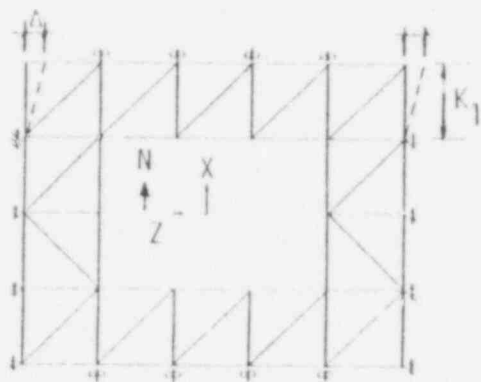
WALL MACRO - ELEMENT MODELING
